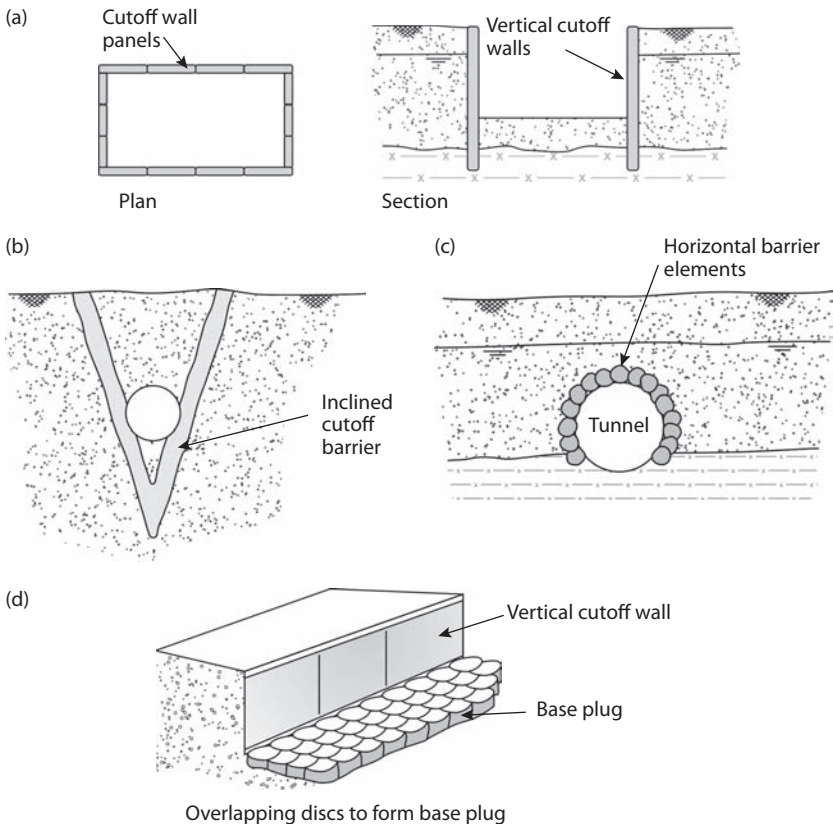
Typical geometries for cutoff barriers. (a) Vertical barriers. (b) Inclined barriers. (c) Horizontal barriers. A horizontal barrier, arranged to exclude groundwater from a tunnel, is located at the interface between higher and lower-permeability strata. (d) Base plugs. A base plug consists of overlapping columns of ground treatment.
